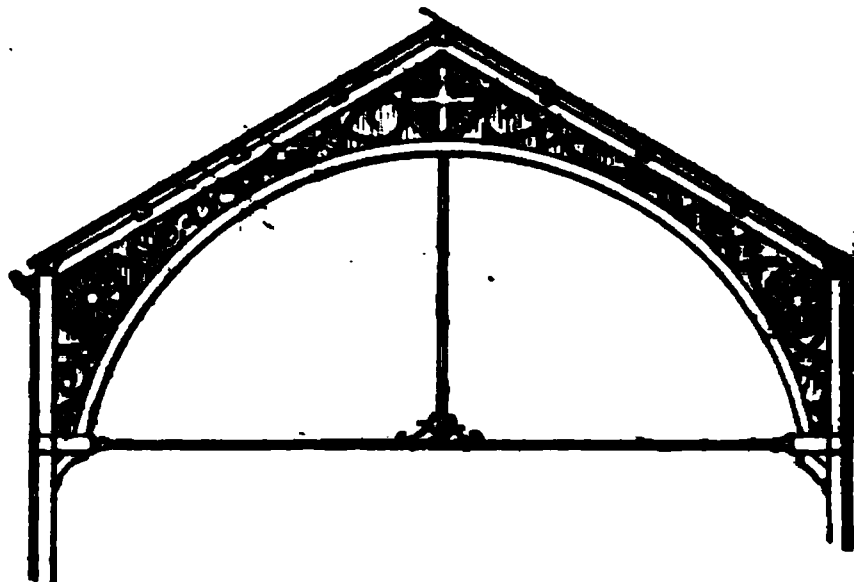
Truss for Metropolitan Concert Hall, New York City
